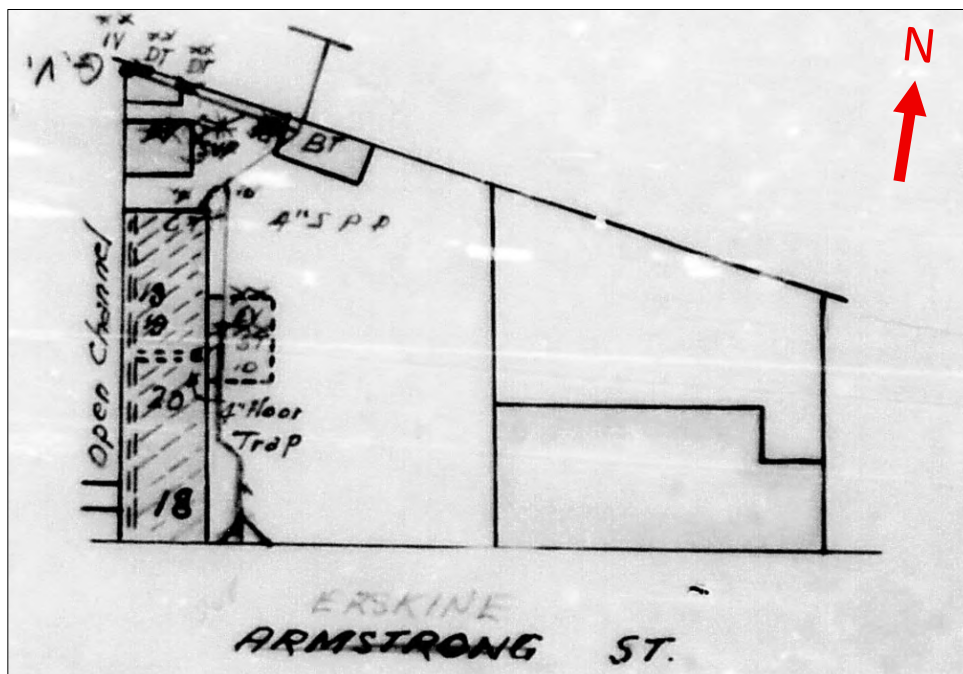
Property service plan from c.1951. It depicts the stable to the west side of the property having already been constructed. Source: Southeast Water.
